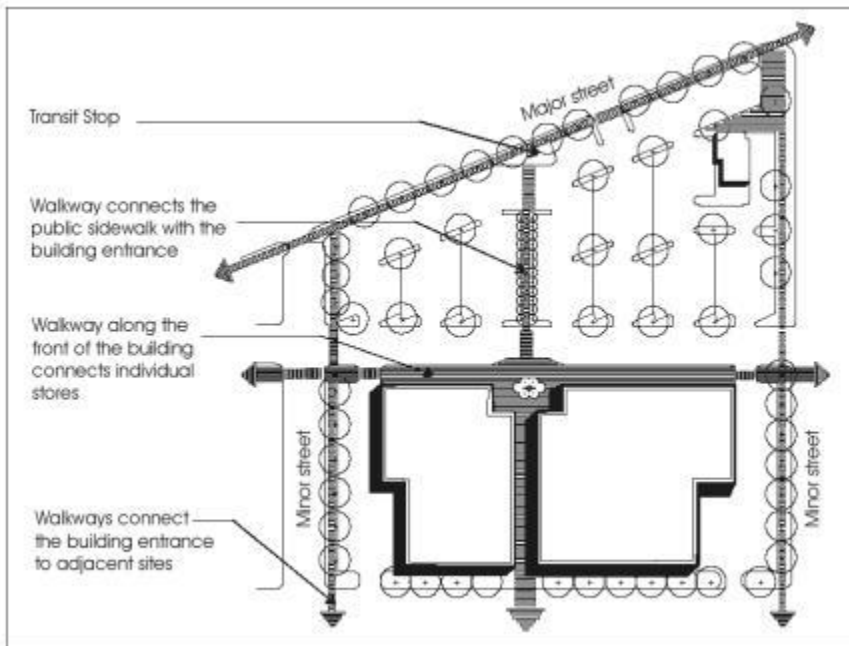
(D): In this commercial site, landscaped walkways provide pedestrian connections. These walkways provide a safe, accessible pedestrian route from the street to the building entry and to neighboring properties.
